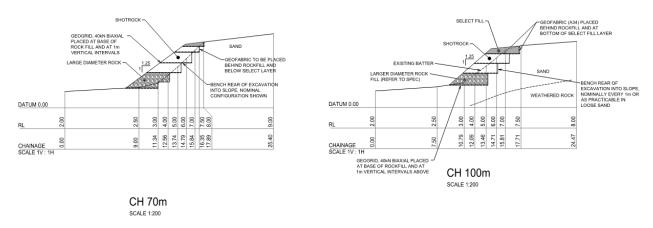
Rockfill batter structure – typical sections (Source: RGS, 2014)
